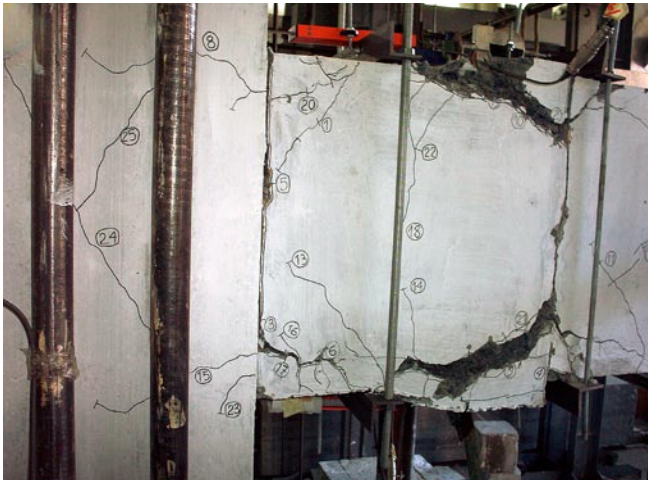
Damage in specimen cast-in-place in beam connection at 4% drift level.
